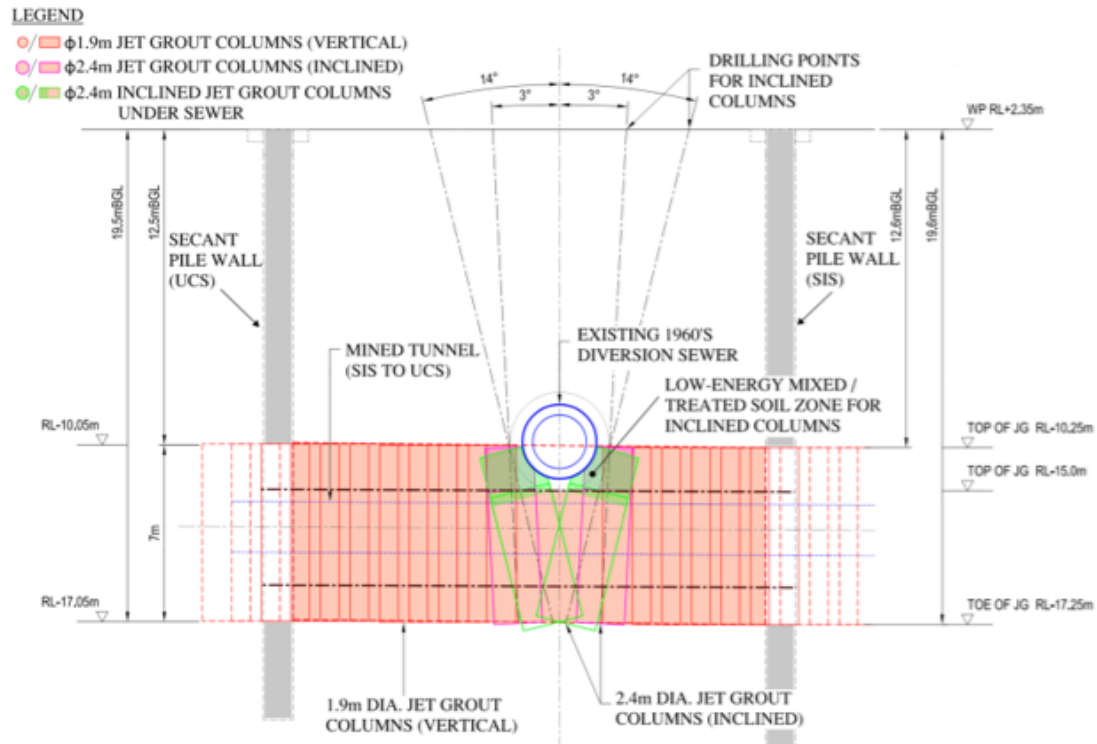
SEM tunnel ground treatment block with inclined jet grout columns (from Menard Oceania 2022).
